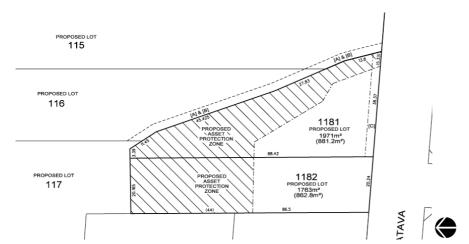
Indicative subdivision plan of southern site (Oratava Avenue)
